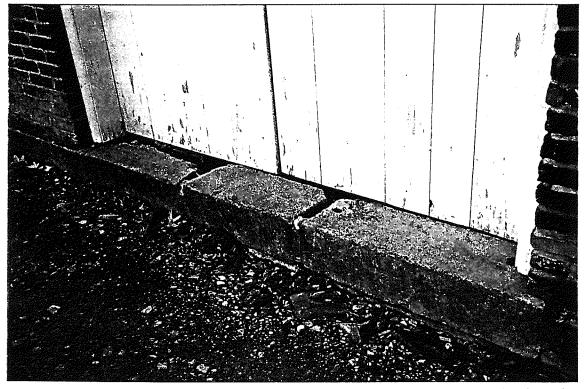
John Brown's Fort , dressed stone water table at north elevation. Note deteriorated mortar joints.
